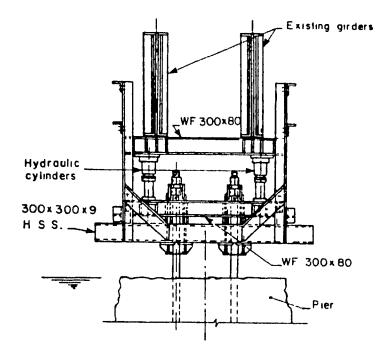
LIFTING MECHANISM SUPPORTED ON STEEL COLUMNS
